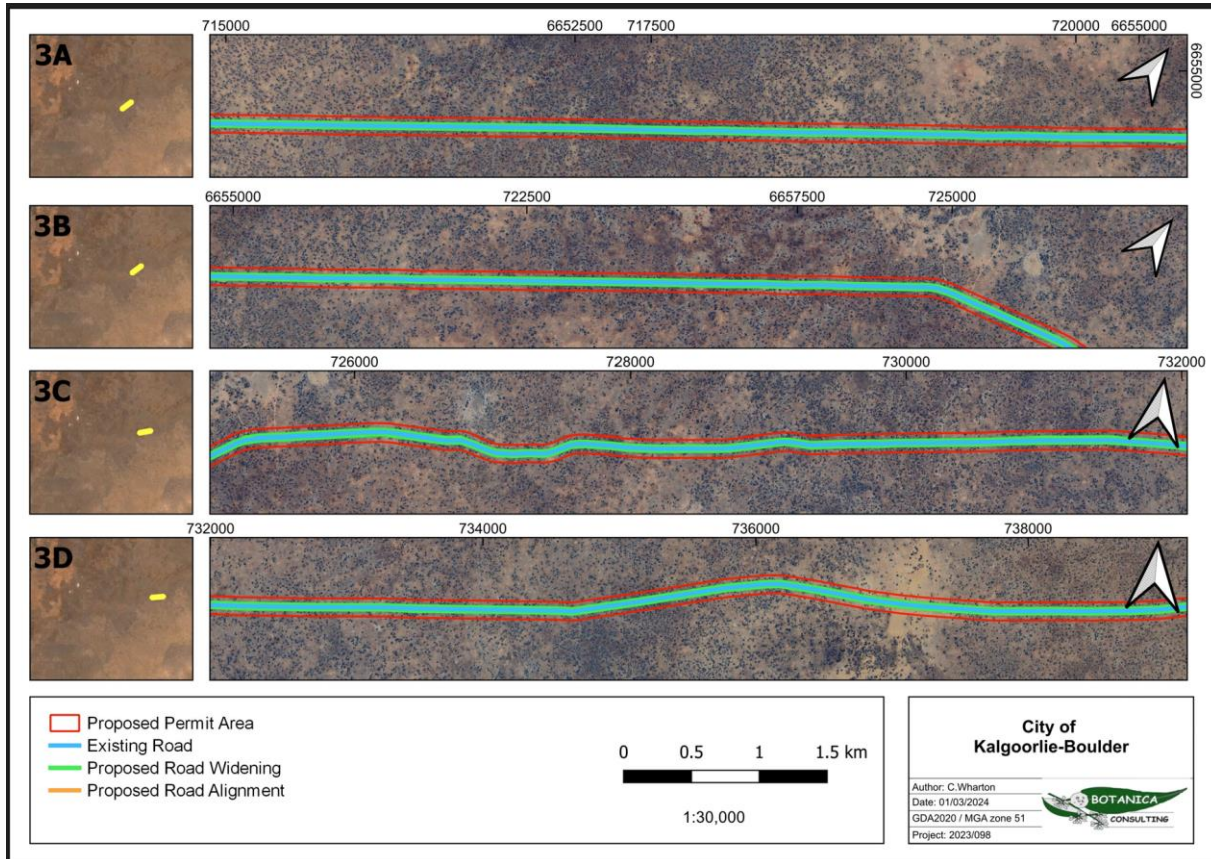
Proposed road widening, and alignment works within the application area (Map 3 of 4)
